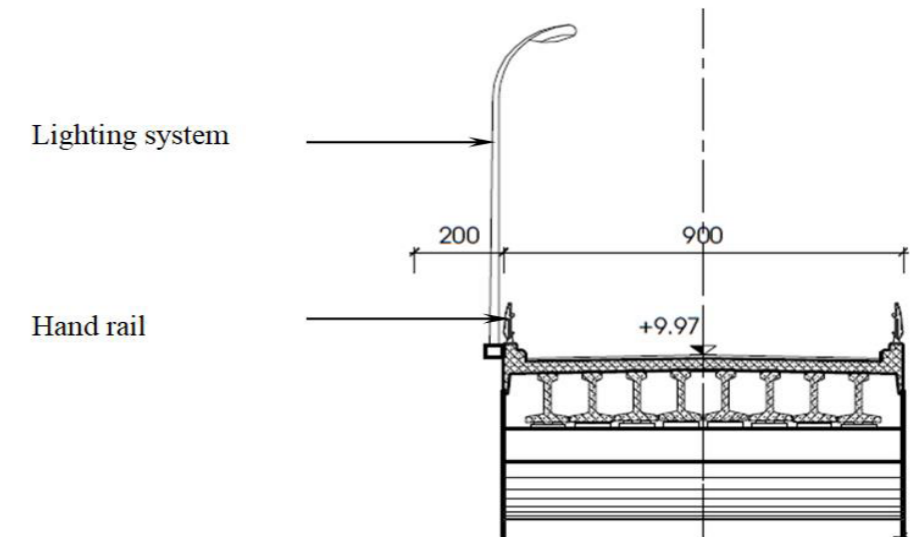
A cross-section of the bridge on Cai Be sluice gate
